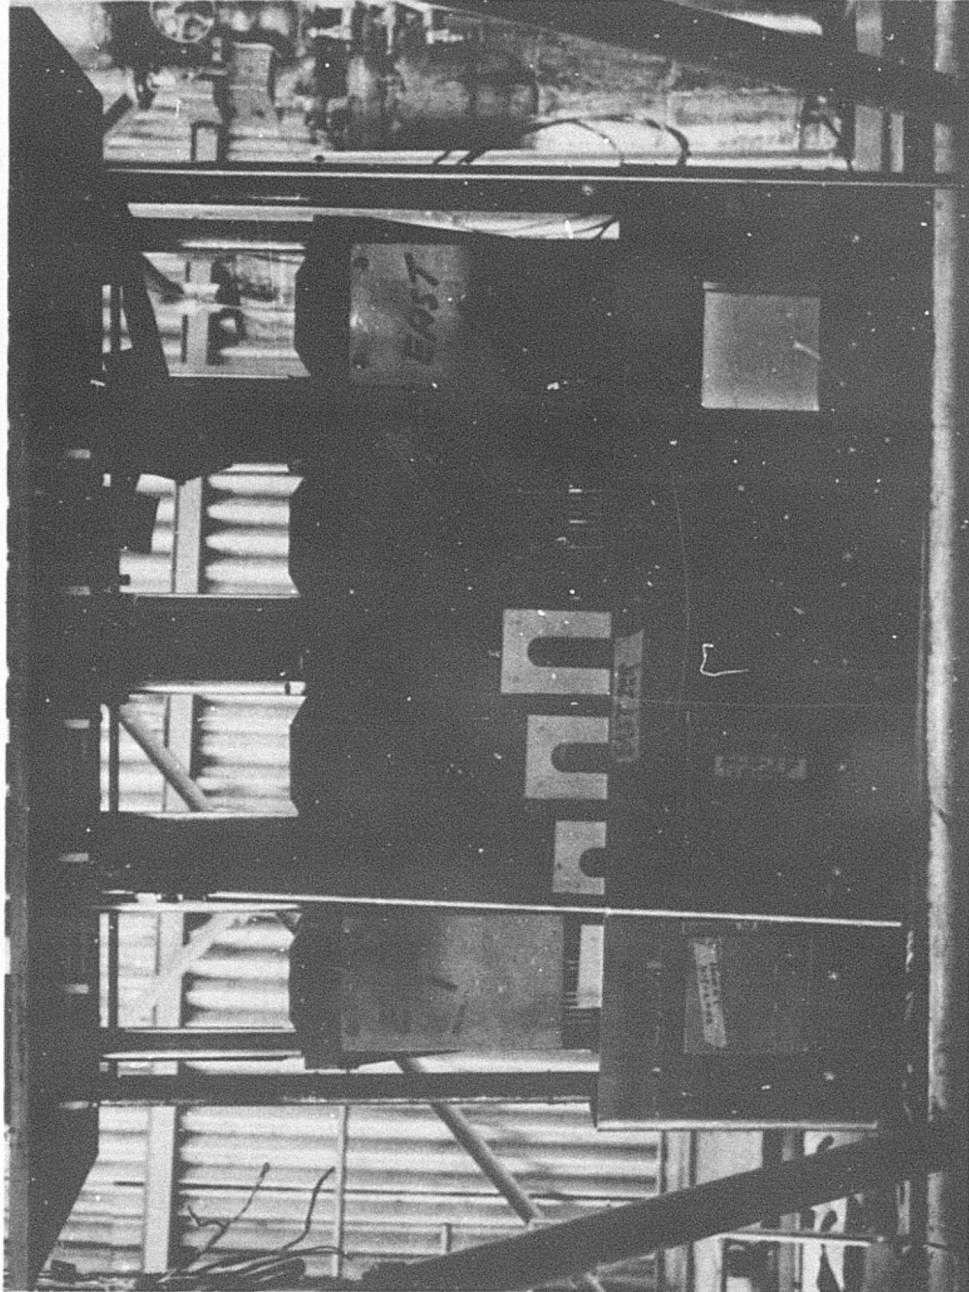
Typical Specimen Loading Showing Static and Dynamic Specimens
